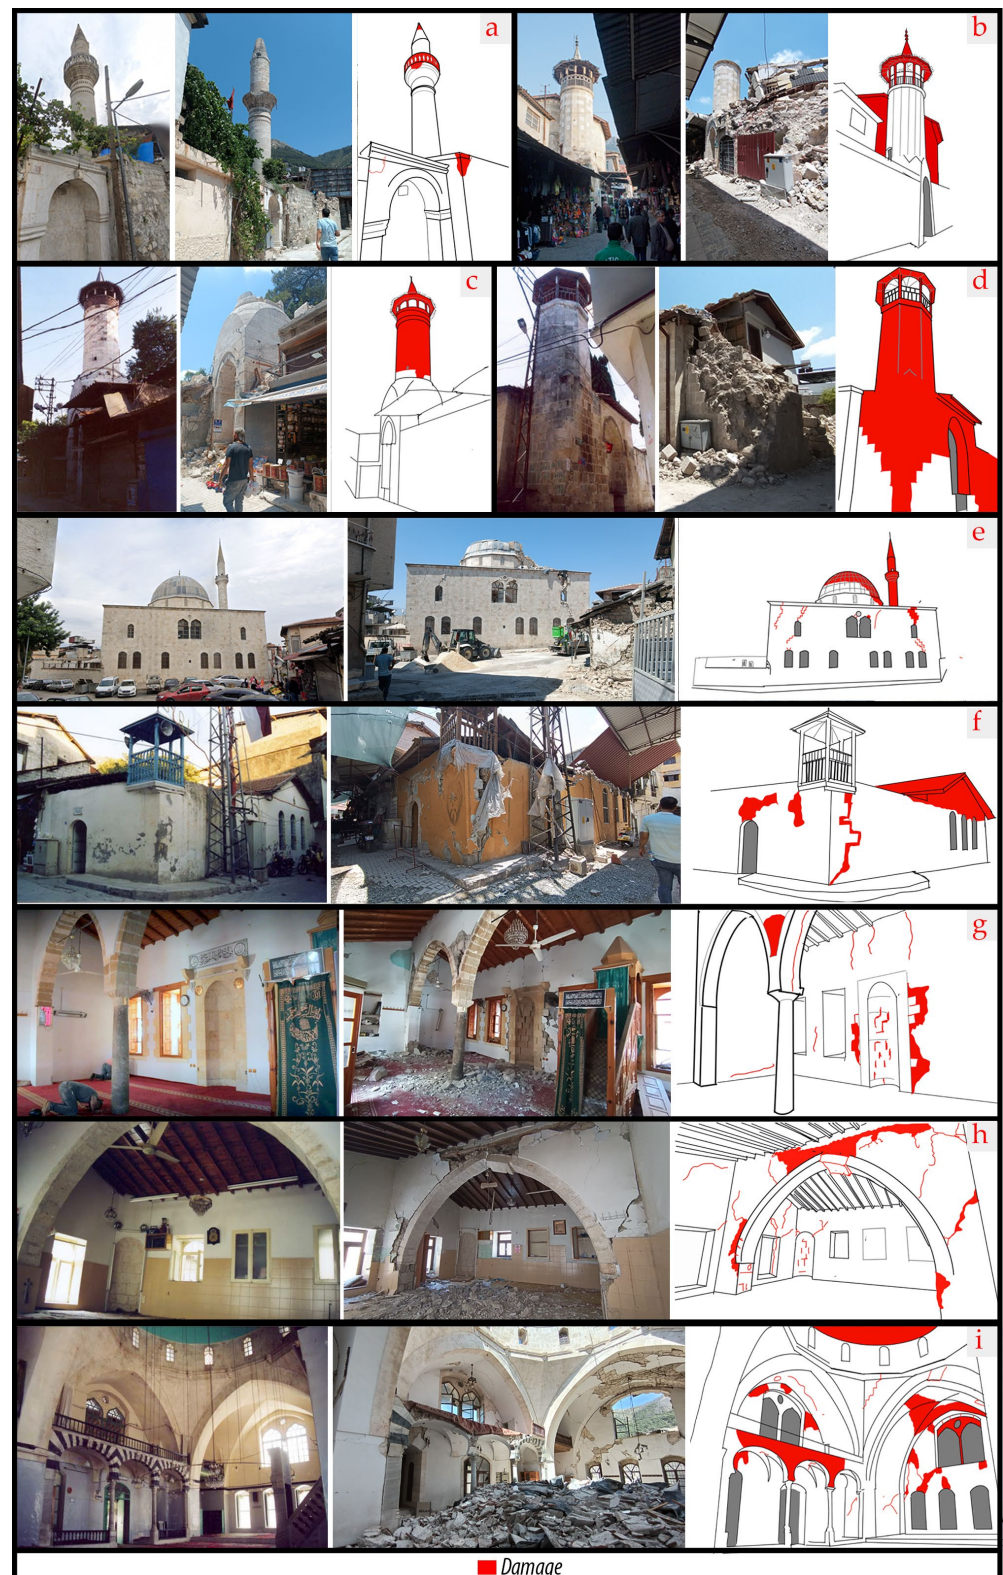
Schematic representations of observed structural damages: (a) Bekir Devocioğlu: Mosque damage to the conical roof and balcony, (b) Mahremiye: damage above the balcony and upper part of the body section, (c) Meydan: damage to the body and above, (d) Kürtfakih: pulpit damage or total collapse, (e) Sheikh Ali: collapse of the minaret and damage to the mosque dome, (f) Zülfikar Köşk: separation between the minaret base and courtyard wall, (g) Mahremiye: voids and cracks between voussoirs (yemerler), (h) Debruz: damage and cracks in the keystone, (i) Sheikh Ali: damage to the dome and arches, adapted from [50–52,54].
